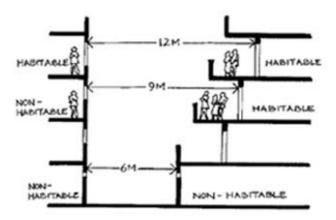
Locate and orient new development to maximise visual privacy between buildings by providing adequate building separation.
